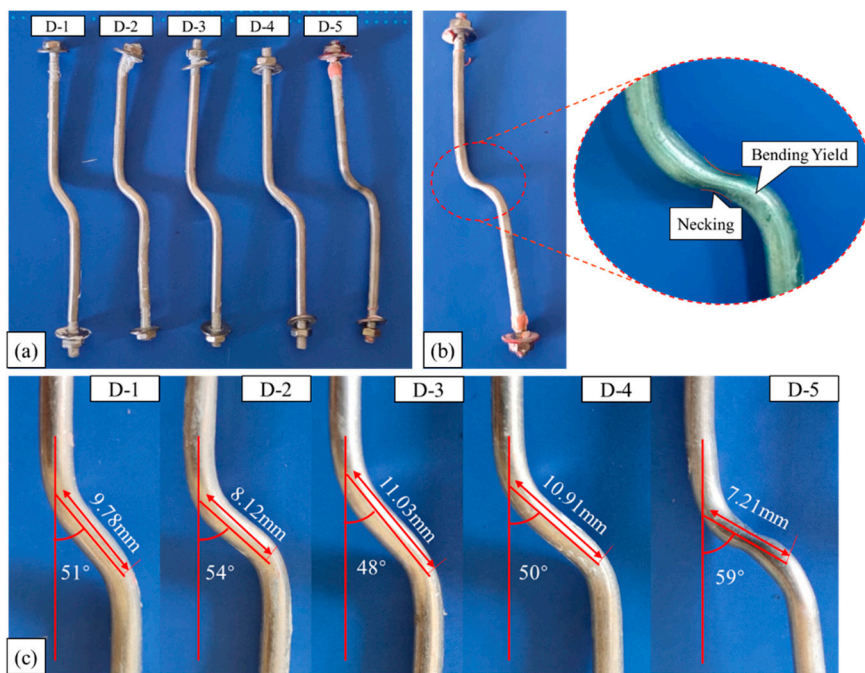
Failure form of end-anchored bolt: (a) bending failure mode of the bolt; (b) necking phenomenon at the bending yield section; (c) detailed views of the bent regions with specific dimensions.
